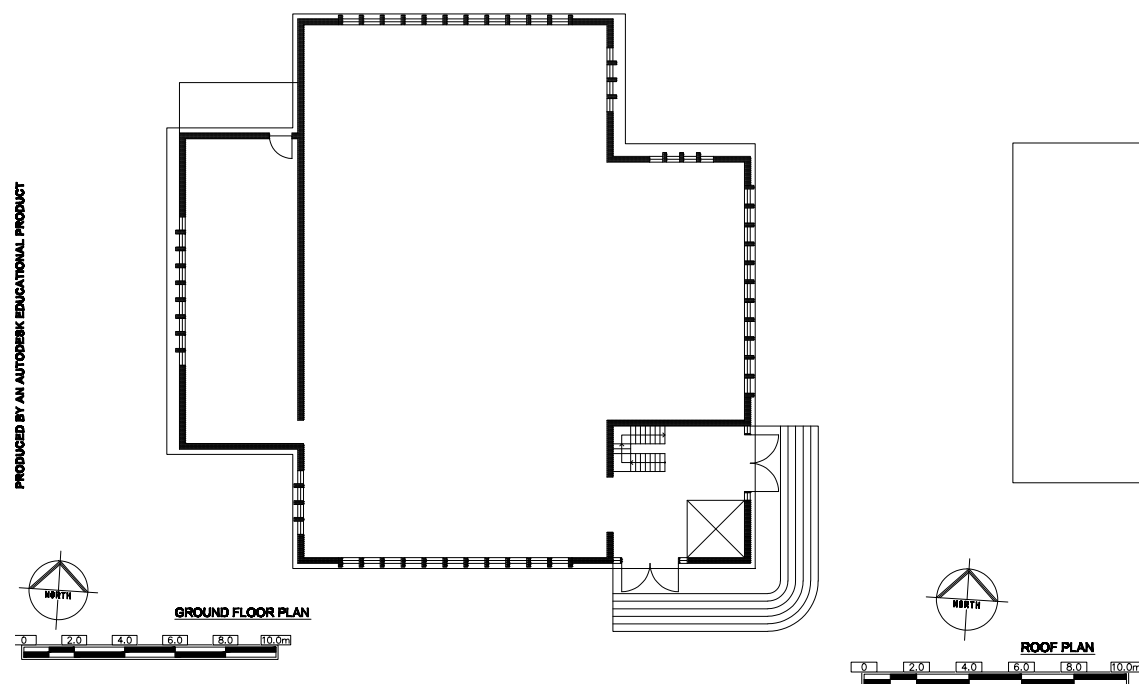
Basic plan and roof plan 2012. The Greek cross is typical of the time of design.
